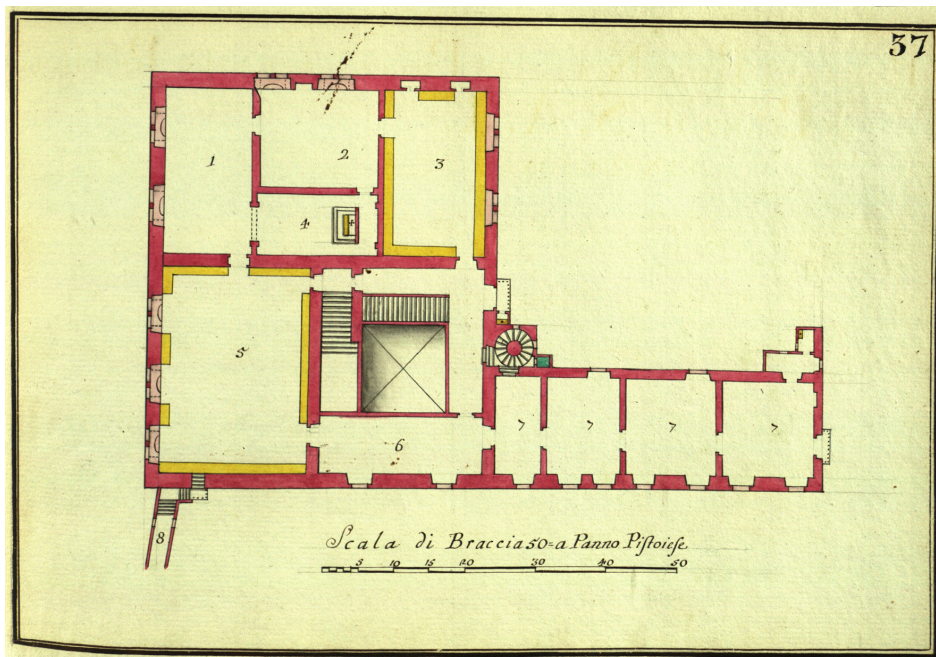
Plan of the first floor of Pistoia's communal palace, 1770–1780 (Palazzi di SAR: 37). 1. winter hall; 2. Ghibelline rooms; 3. summer lounge for the academy; 4. chapel; 5. council hall; 6. Guelf rooms; 7. *gonfaloniere* rooms; 8. passage.]
